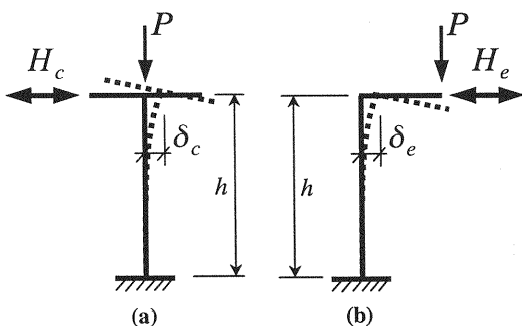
Centrally loaded and eccentrically loaded steel bridge piers
